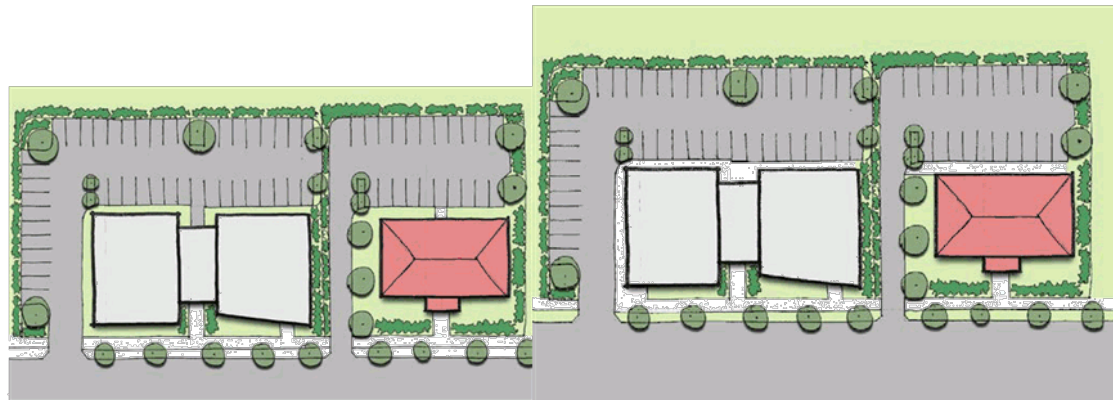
plan of preferred off street car parking locations in Precinct 2
